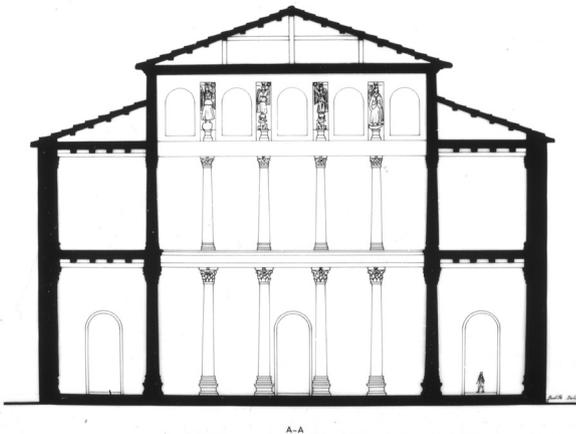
Ascalon, reconstruction of the figured pilaster wall.
